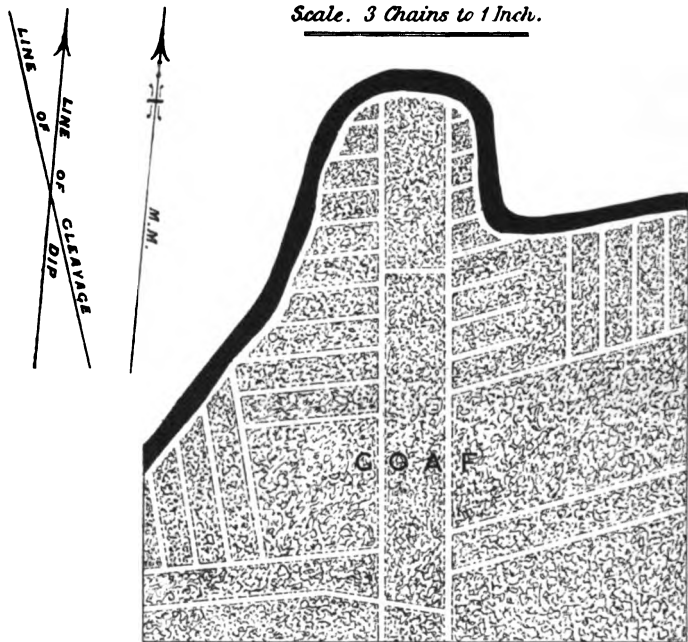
RISCA COLLIERY, NEAR NEWPORT, MONMOUTHSHIRE. PLAN SHOWING LONGWALL METHOD OF WORKING THE BLACK VEIN.
